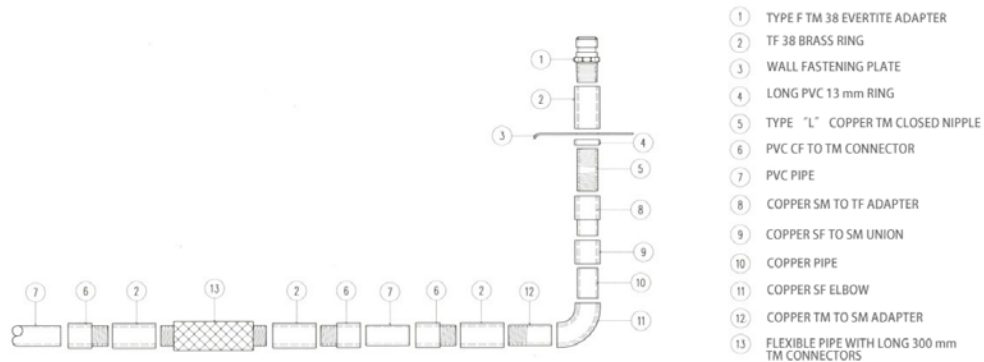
DRINKING WATER TANK FILL PIPE / SOURCE: SHQ
